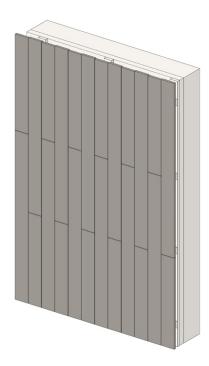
Cladding board joints arranged in a checkerboard pattern
